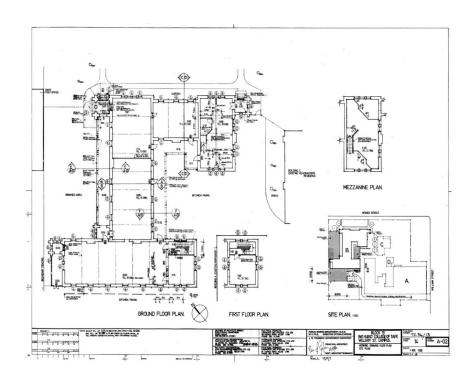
Part 4: The 1986 measure drawing FLOOR PLAN & SITE PLAN. A number of alterations have occurred to the building since this drawing was made with some partitions removed, walls opened, the mezzanine floor and stair case replaced and internal display partitions added.
